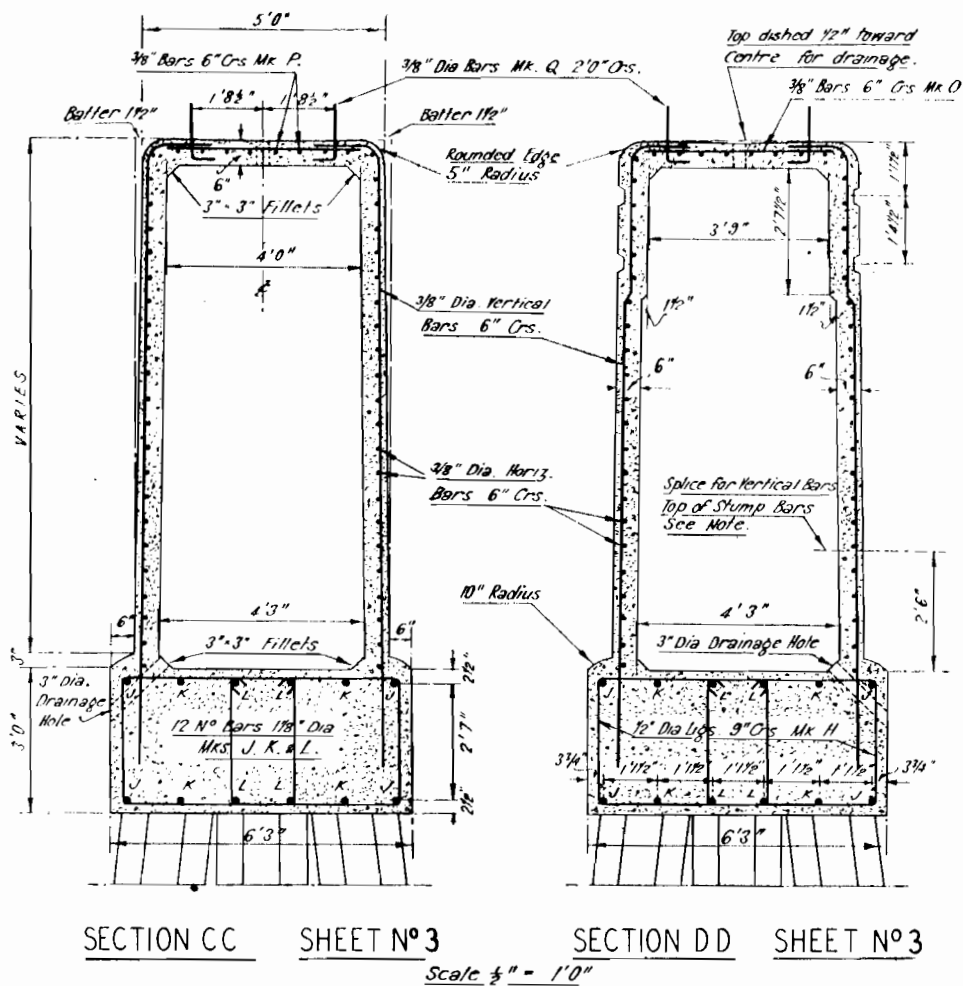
FIGURE L.—Punt Road Bridge—Cross section through Piers.
